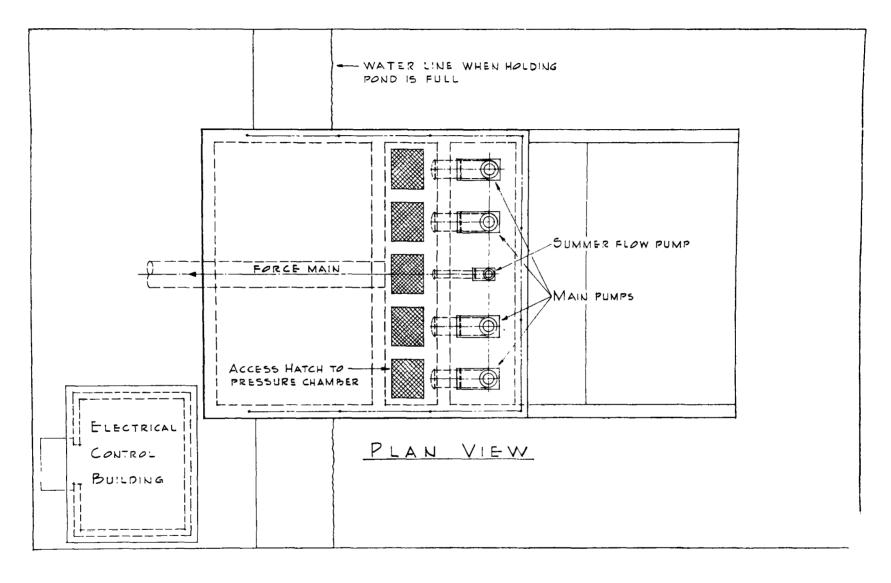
PLAN OF TYPICAL PUMP STATION FOR RESERVOIR WITHDRAWAL
